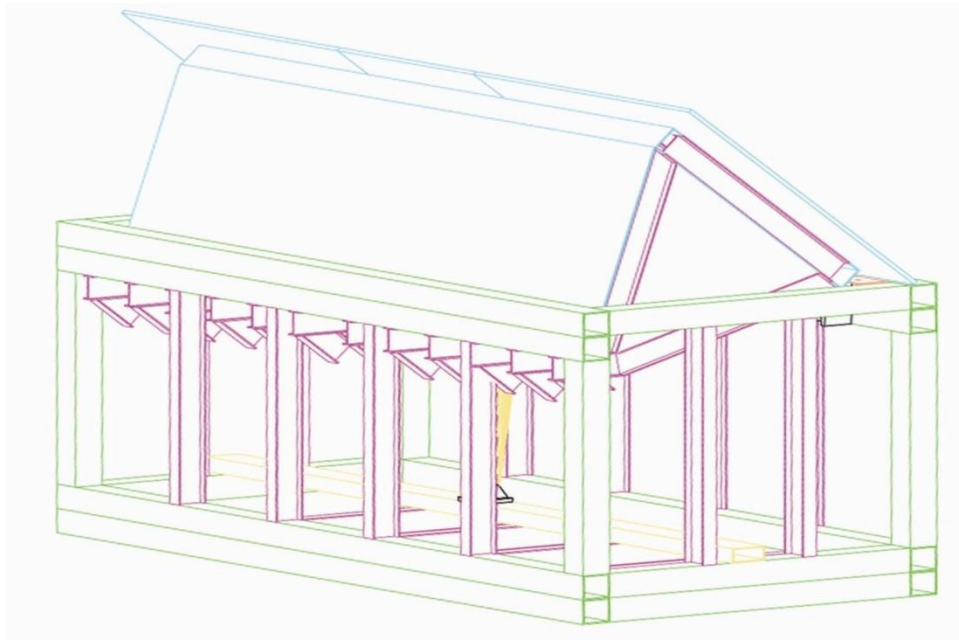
(e) 3-D Construction - Isometric (Road Blocker raised)
